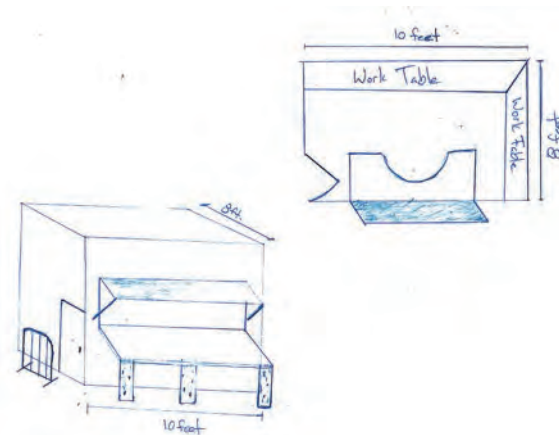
Design E: 10' by 8' by 8' Storage shed for panels
